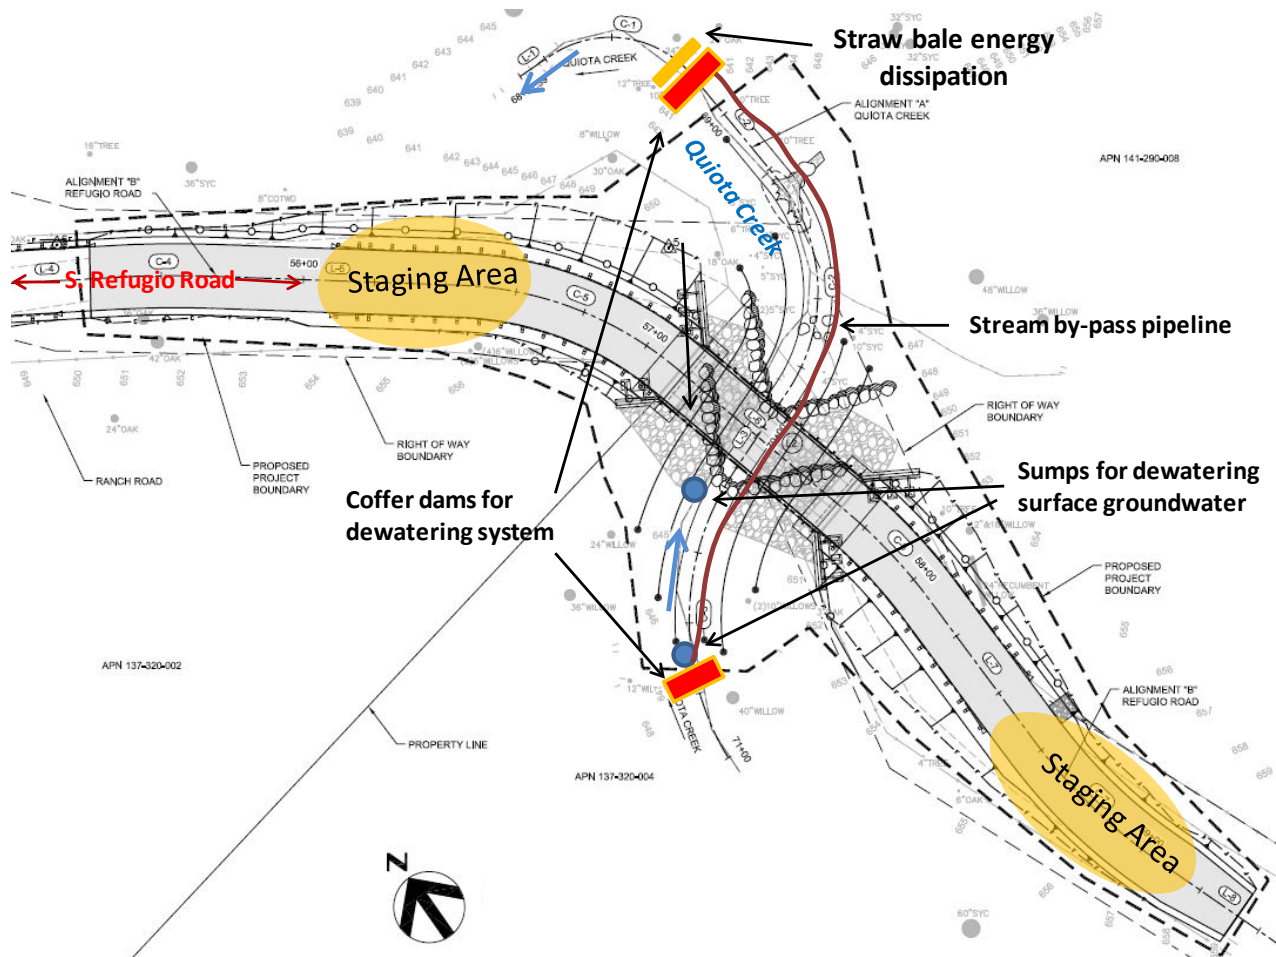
Site dewatering plan showing the stream by-pass system and sump for dewatering near surface groundwater.
